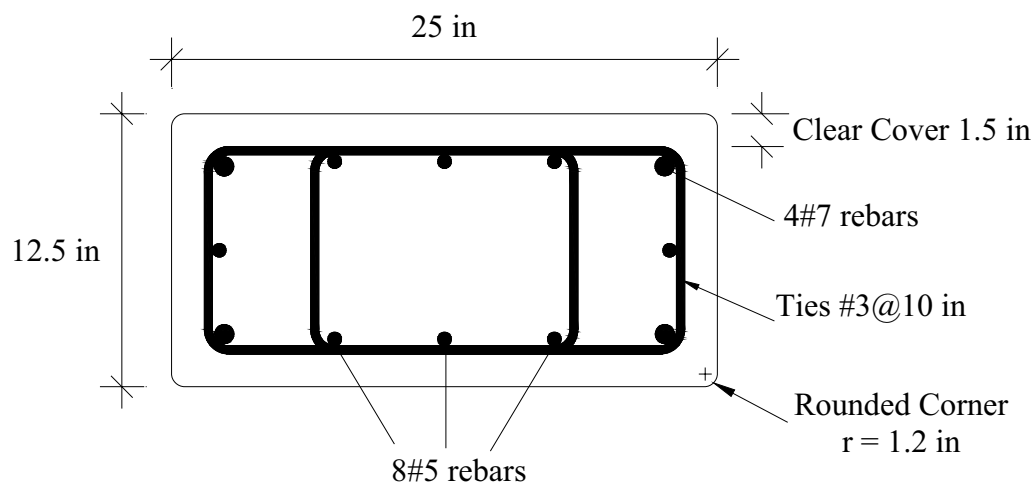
Section D-D, Type A Tie Overlapping Detail; Specimens B1, B2 & B3
